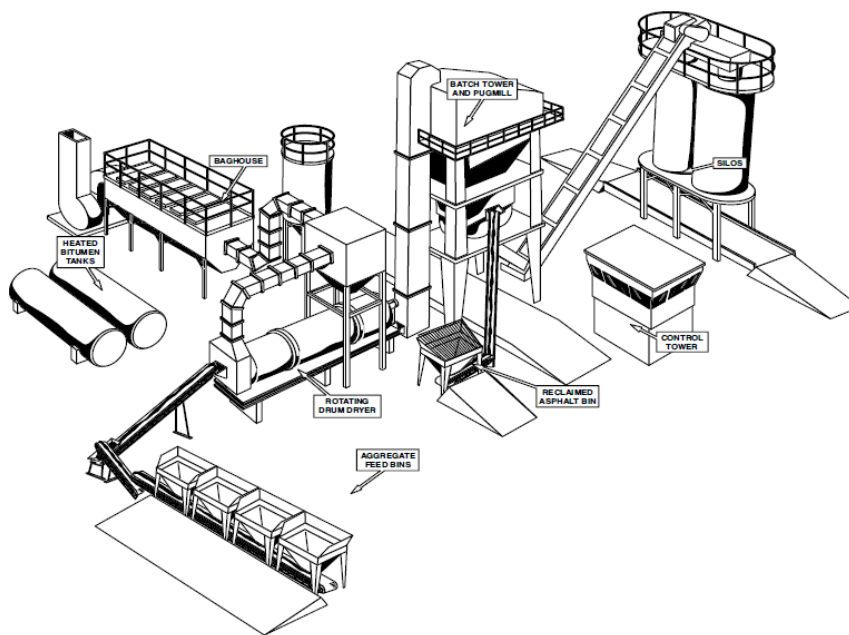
Batch plant layout (European Asphalt Pavement Association, 2011)
